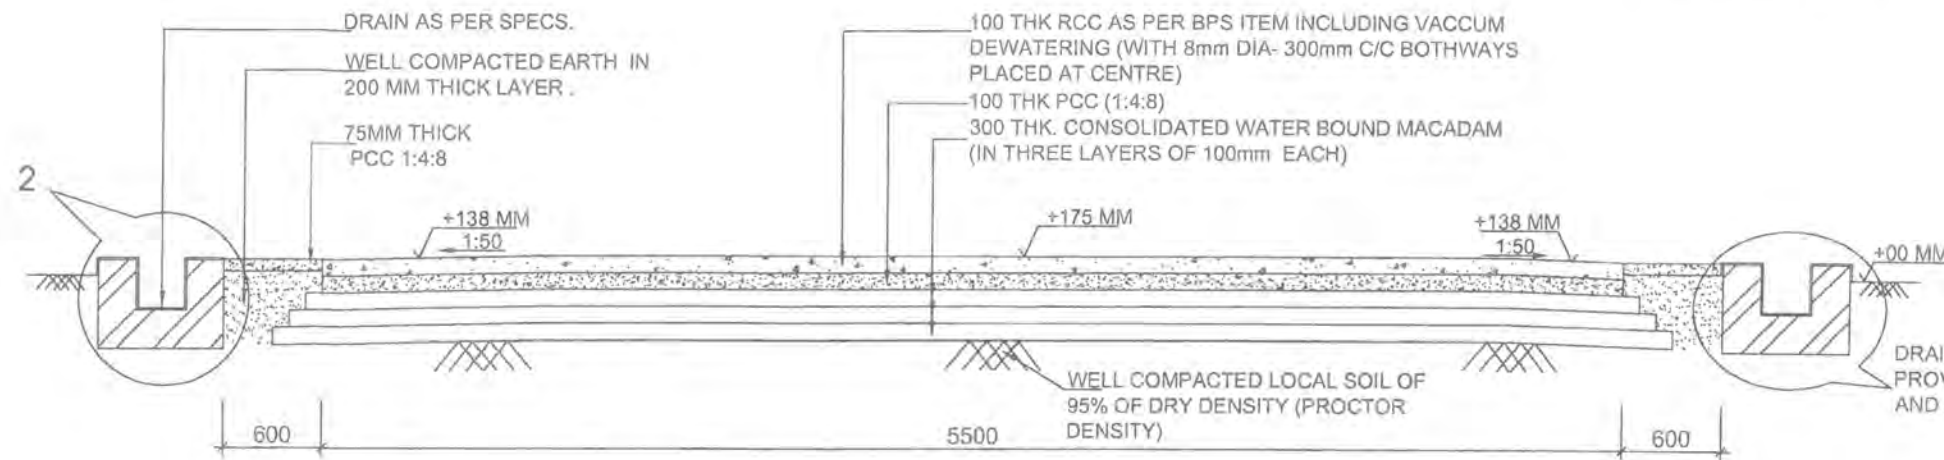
## DETAIL OF CONCRETE ROAD (RIGID PAVEMENT)
